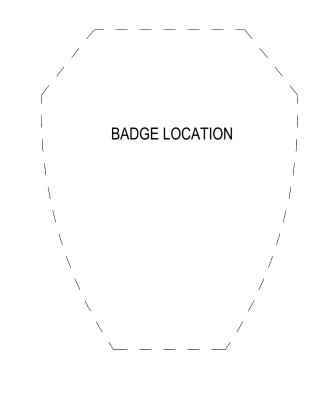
# EXHIBIT 'H' TRAINING/ MAINTENANCE FACILITY (BUILDING 1) SIGNAGE DETAILS
